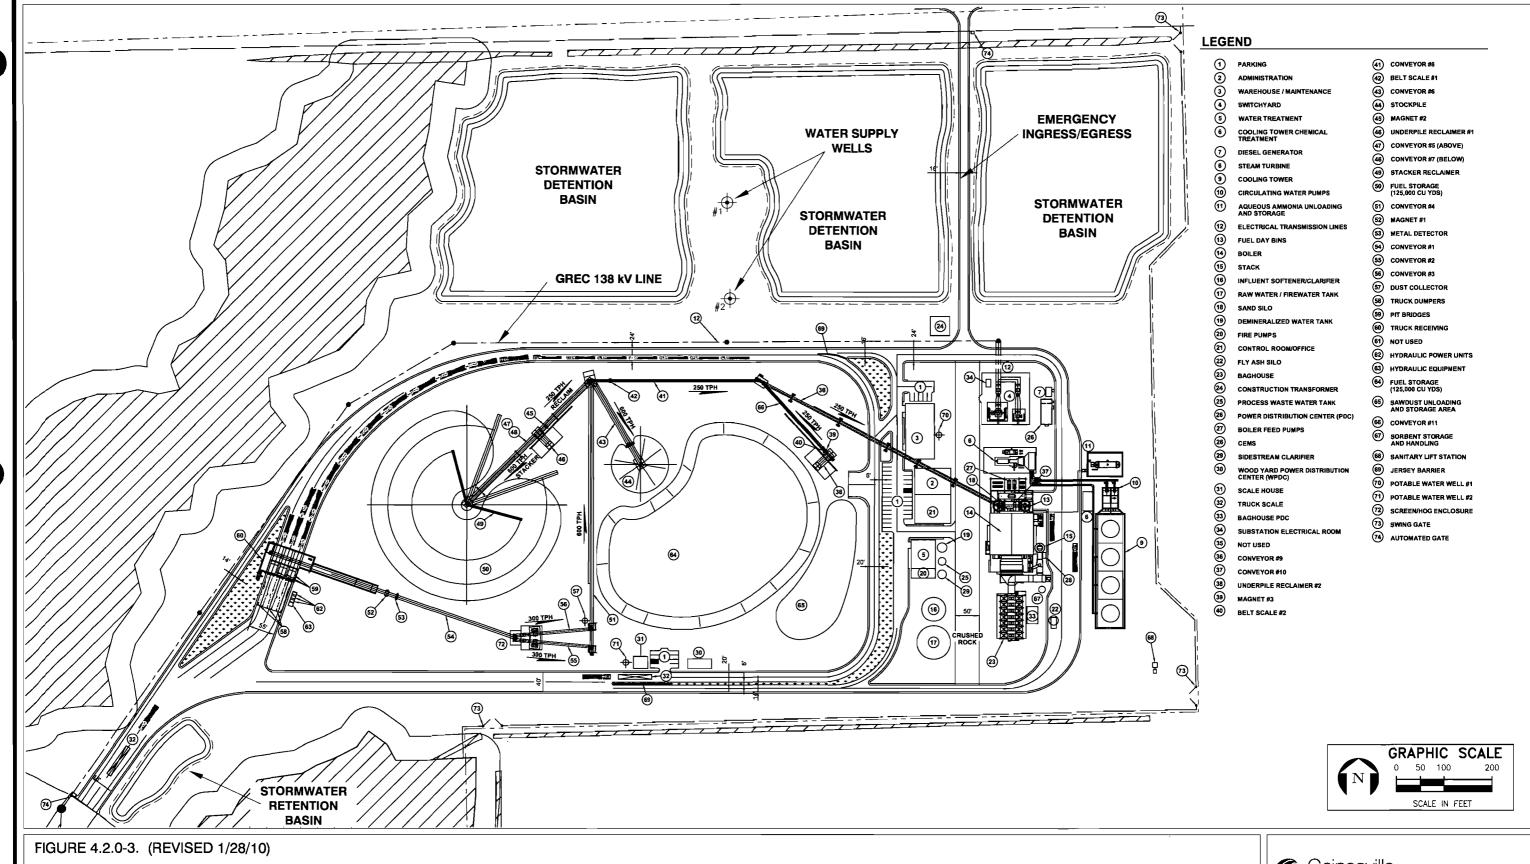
(REVISED 01/28/10) LAYOUT OF PROPOSED FACILITIES WITHIN GREC SITE
